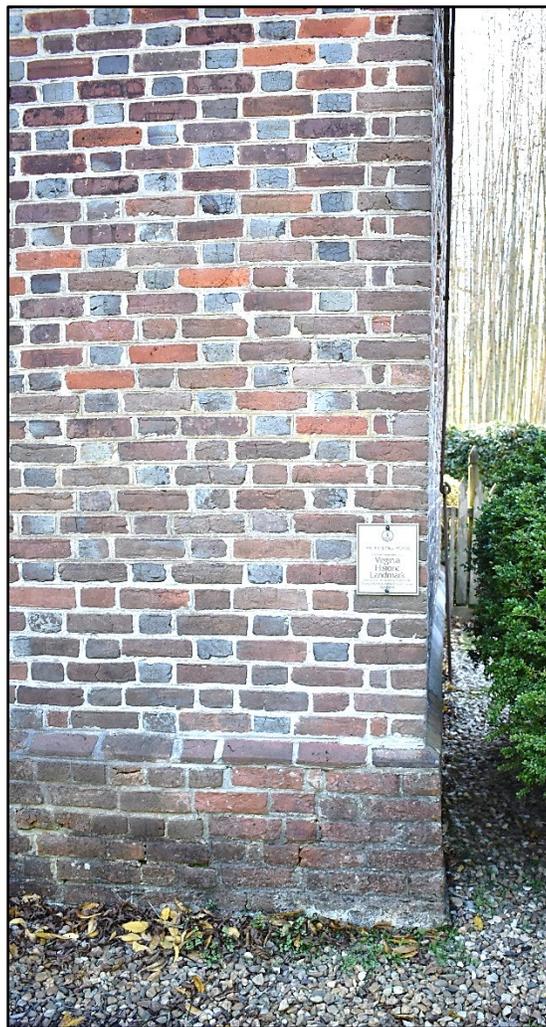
Detail of the brickwork on the east elevation of the Keeling House showing English bond water table, beveled cap, and Flemish bond with glazed headers above. Note closers at corner of wall.
